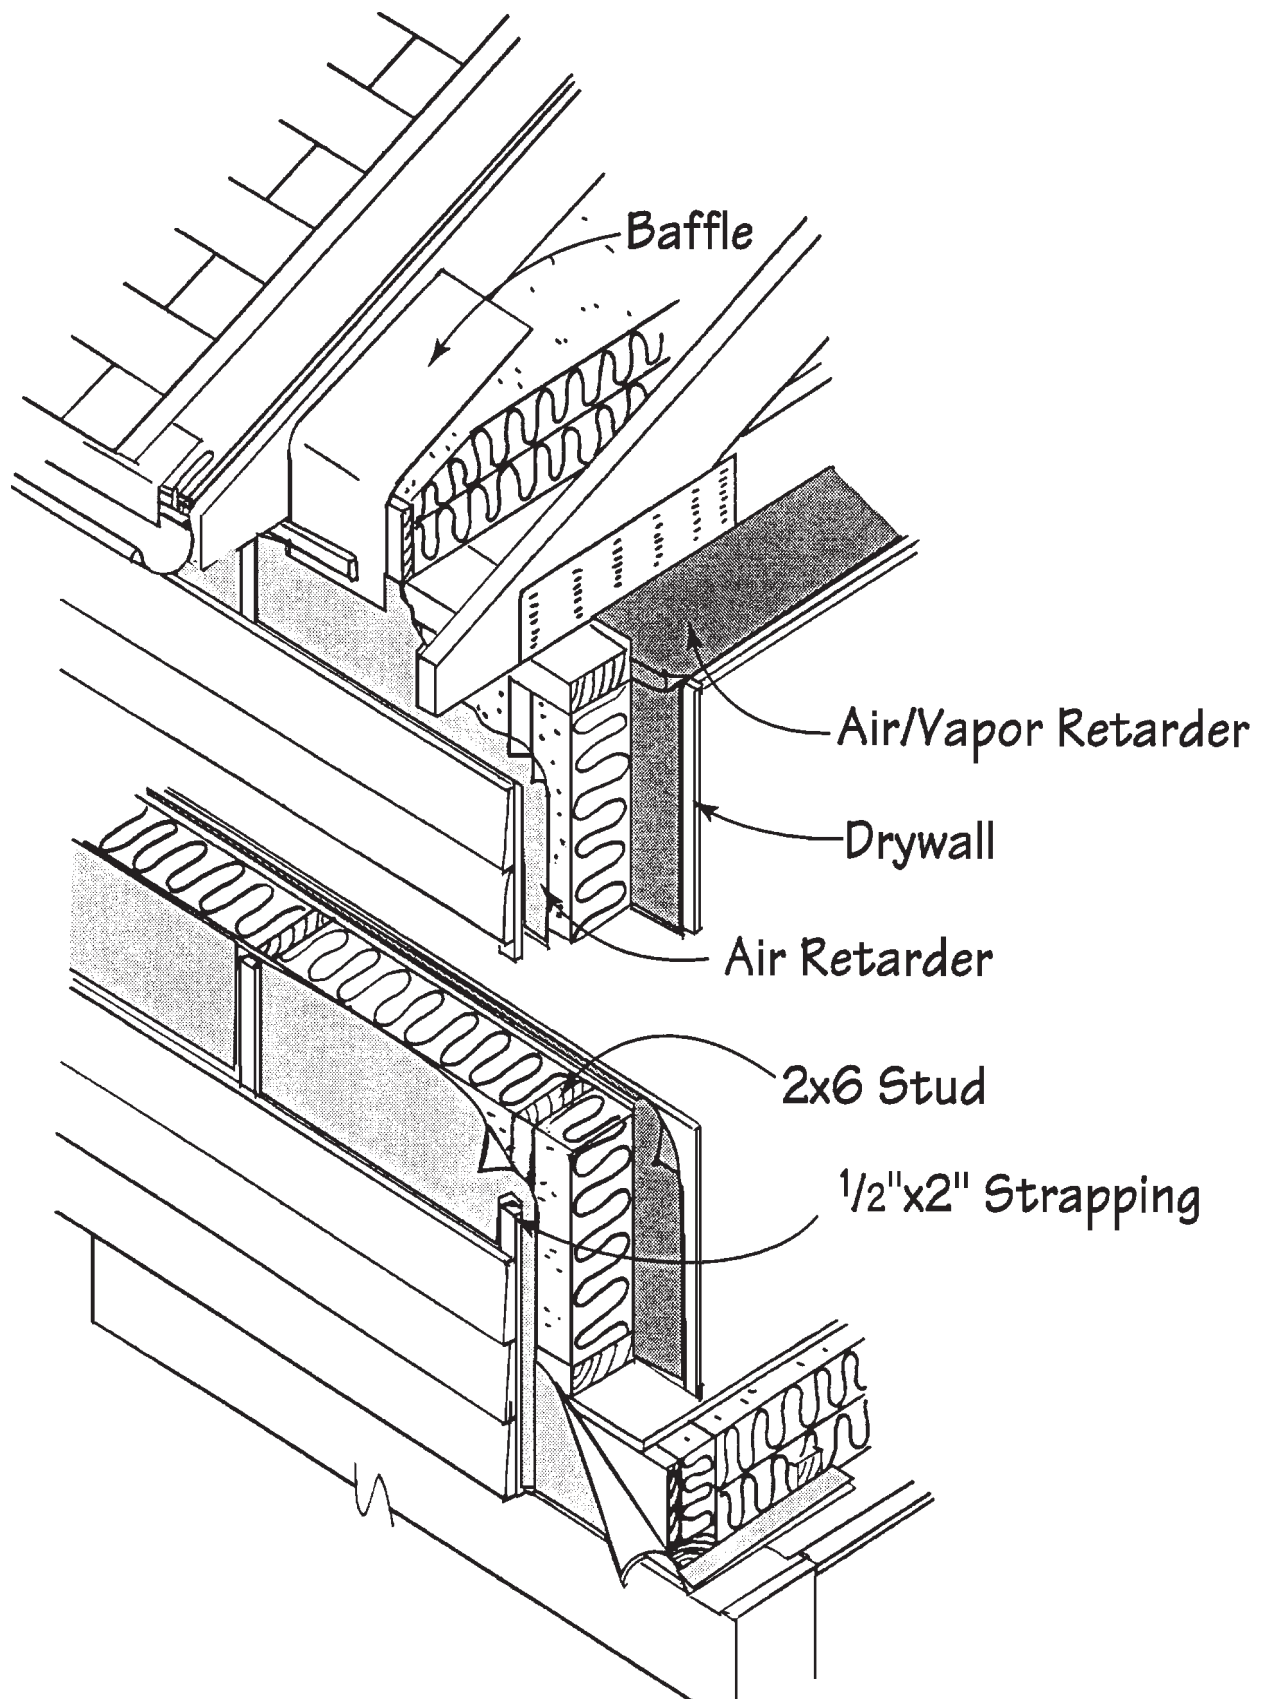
A full cut-away cross section of a wall and roof assembly showing integration of exterior ventilated cladding with stud framing. Graphic from Norwegian Building Research Institute. The strapping shown could easily be substituted by the $\frac{3}{4}$ inch thick, 2 inch wide, A WW material used in the example in the photographs (Figures 218 through 223).
